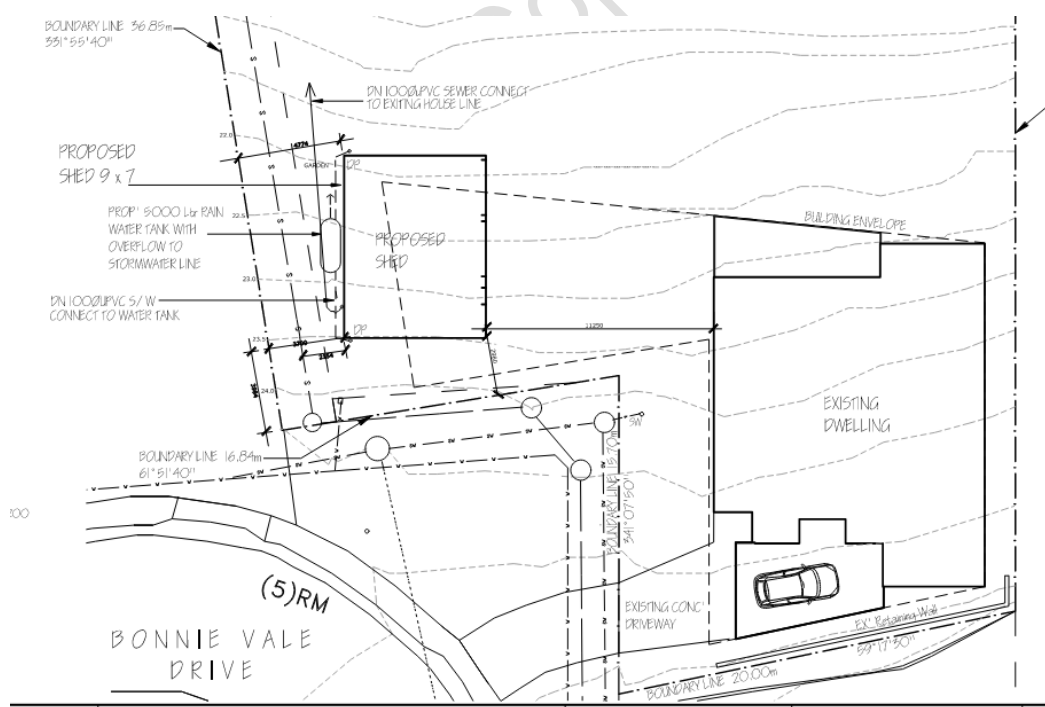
Extract of the current site plans showing the full scope of the proposed development under DA-2025-46.
